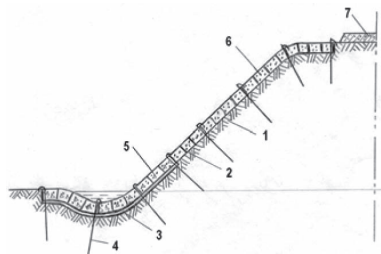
Standard structure of slope protection. (1) Bottom layer of slope; (2) Geocell; (3) Geotextile; (4) Anchor; (5) Gravel fill-in; (6) Turf-sand mixture; (7) Pavement.
